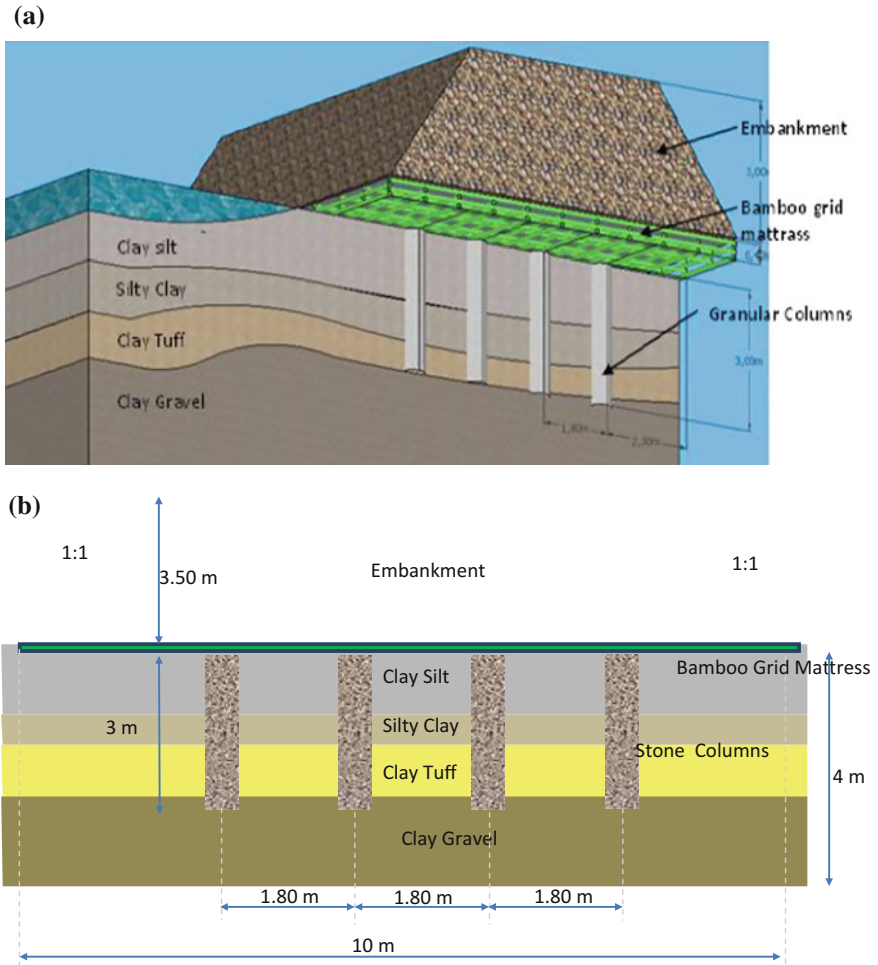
Schematic (a) and cross sectional (b) views of reinforced embankment with bamboo mattress and stone columns.
